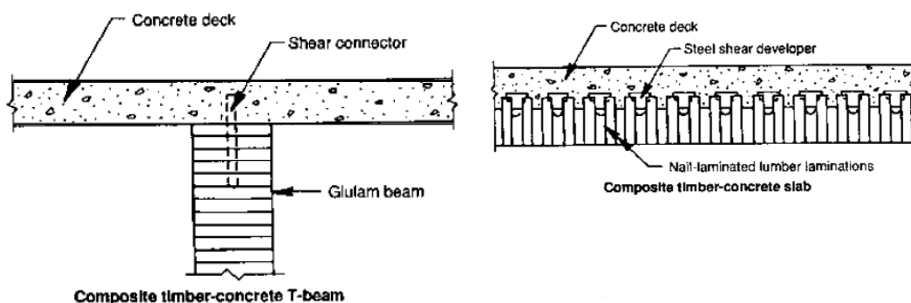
Composite bridge cross sections made of timber and concrete. The left figure shows a glulam beam with a concrete slab casted on it. Plane composite bridge decks are made of a timber deck with concrete cast on the top, shown in the right figure. (Ritter, 1990)
